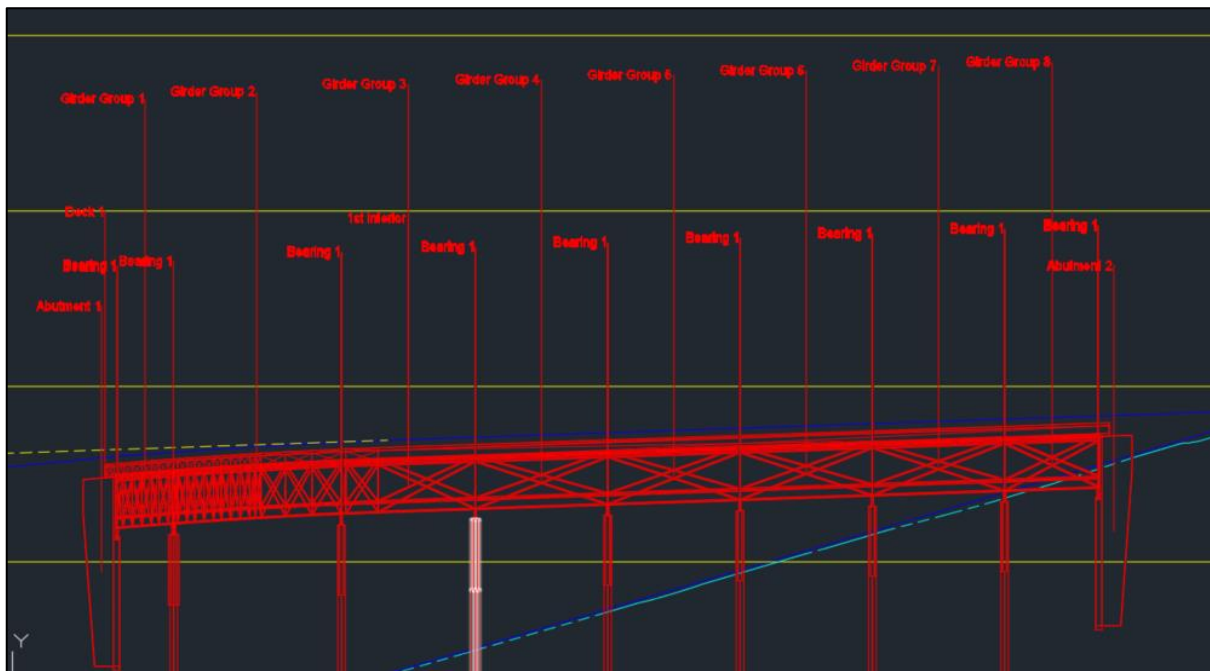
Bridge in Road Long Section/Vertical Profile
